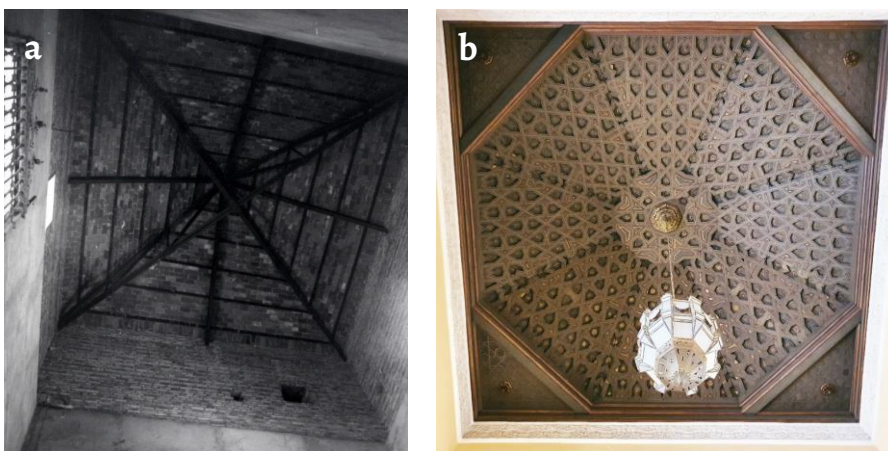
Ceiling of the main staircase: a) view of the previous metal structure (1972) (R. Queiro private archive); b) coffered ceiling of the main staircase. Authors' photography (2021).
